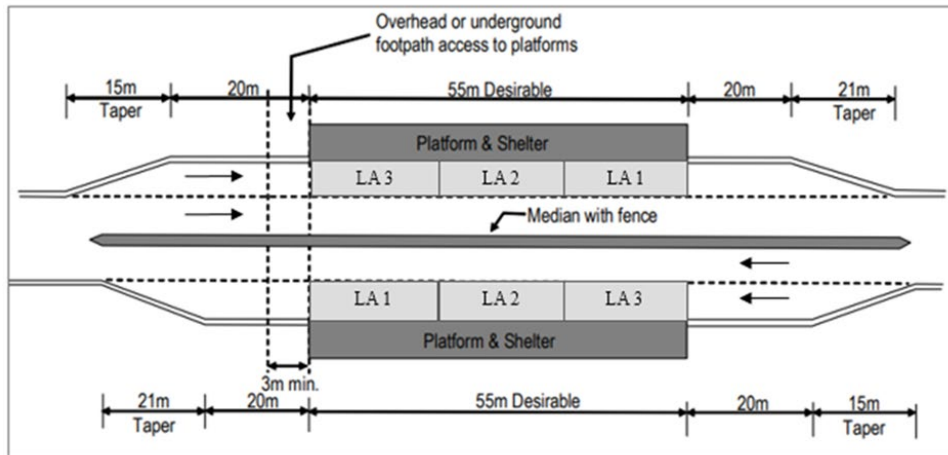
Typical BRT station layout on South East Busway, Brisbane, Australia (5)
